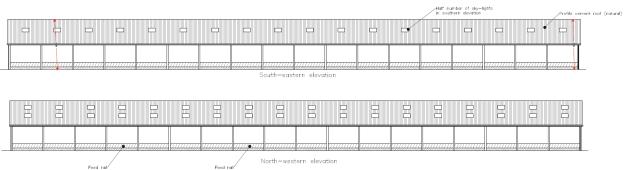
Building B – South-Eastern Elevation and North-Western Elevation
